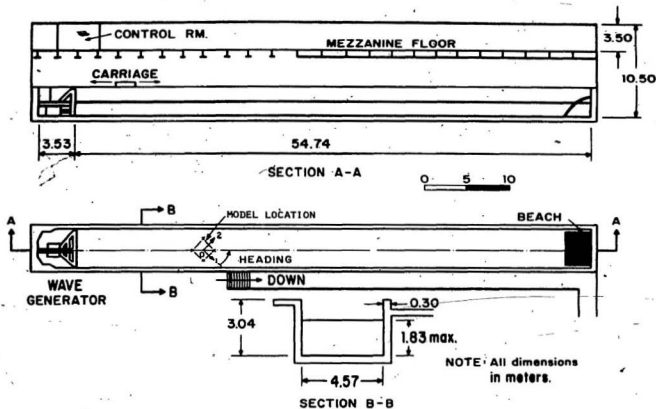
ELEVATION, PLAN AND CROSS-SECTION OF THE WAVE TANK AT MEMORIAL UNIVERSITY.
